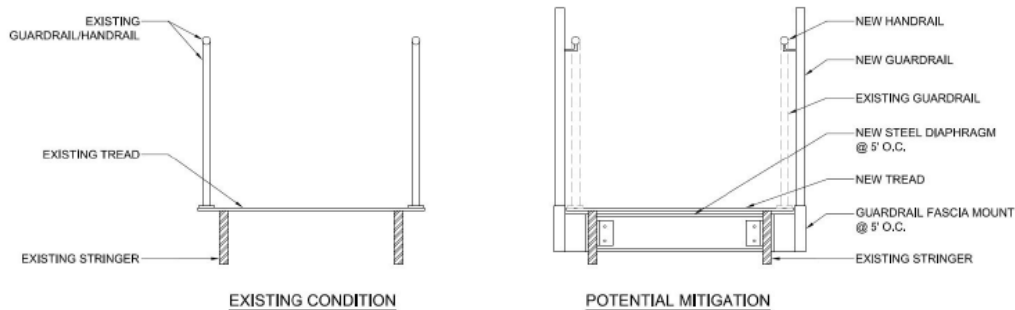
Cross sectional view of platform stairs showing existing and potential guardrail / handrail system.
